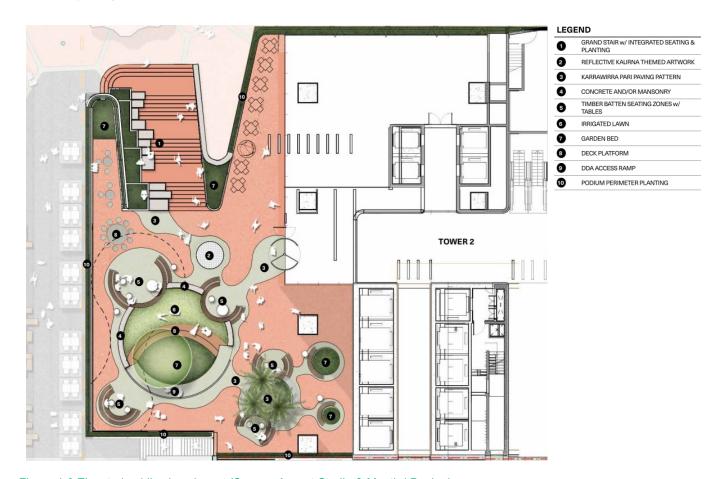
Elevated public plaza layout (Source: Aspect Studio & Mantirri Design)
